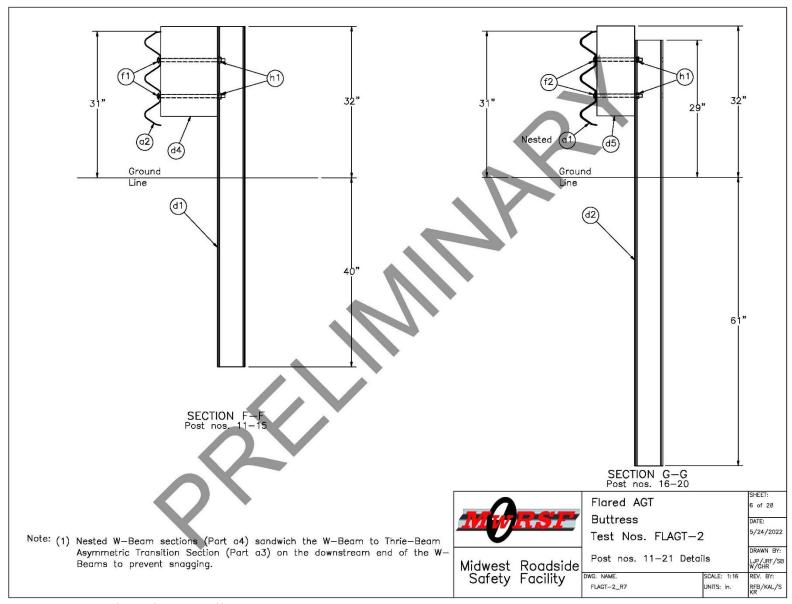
Post Nos. 11 through 20 Details, Test No. FLAGT-2
